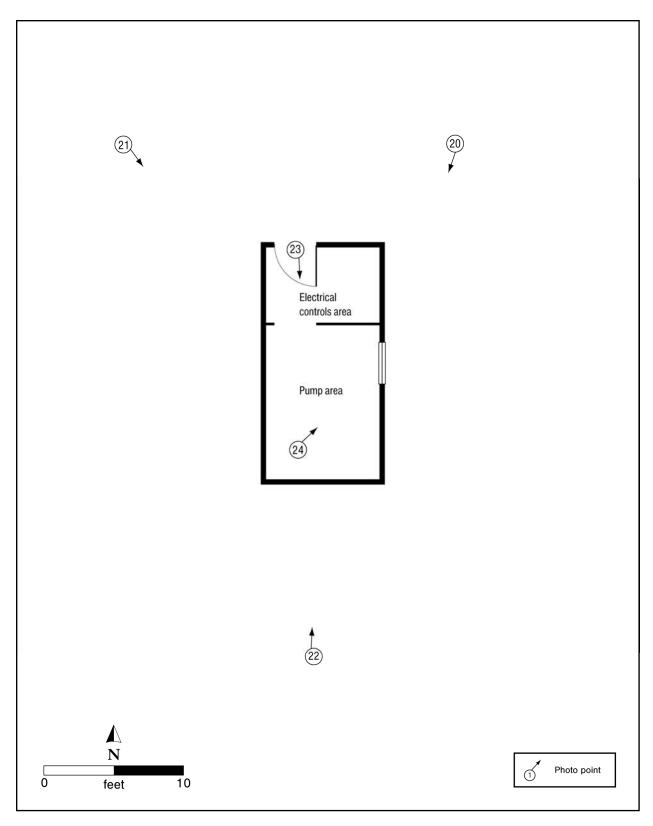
Floor plan of pump house, Parcel Number 117-05-068F.
